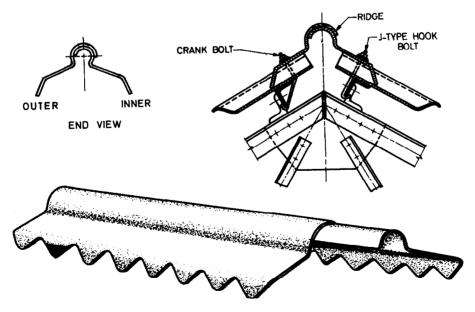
Details Showing Method of Fixing Close Fitting Adjustable Ridge Pieces
